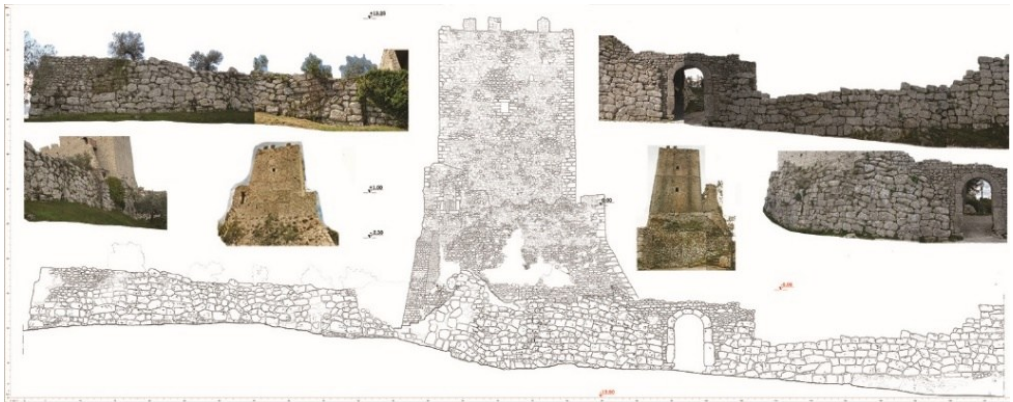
Tower of Cicerone (Arpino)- North side. Survey of the fixture wall. Reworking (M. Saccucci, 2018) of technical drawings (E. Gemmiti, 2014¹)
